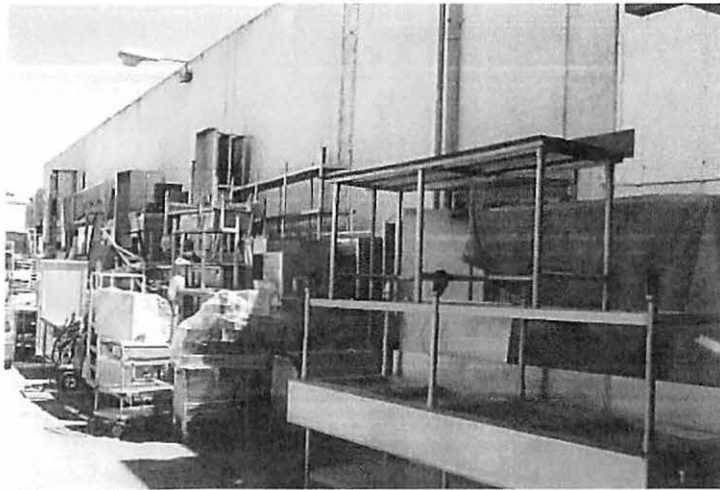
Partial view of north facade of the one-story warehouse section, facing southeast.
